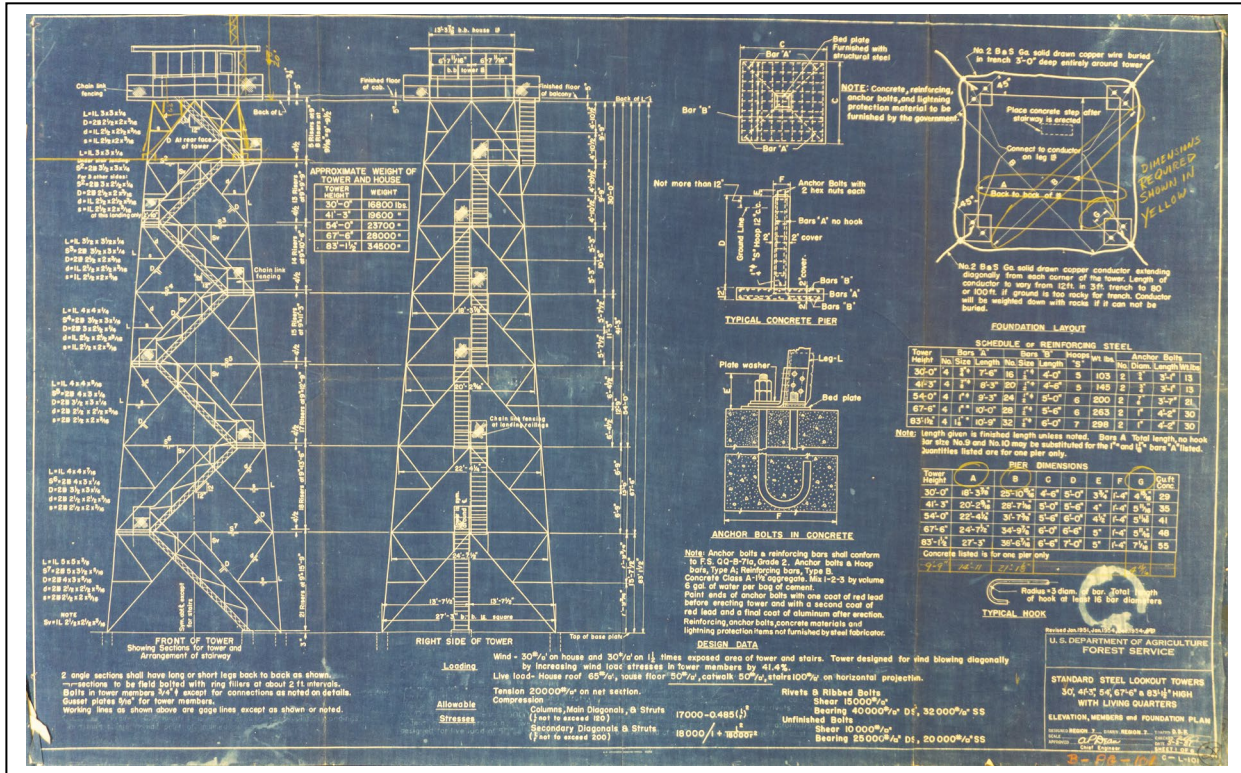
USFS design used for Ishpeming Fire Tower. Note the yellow notations on the drawing, which indicate that only the top 9'- 9 1/2" tall portion of the tower was to be used. Image provided by Isle Royale National Park from their archives at Keweenaw National Historical Park in Houghton County, Michigan.
